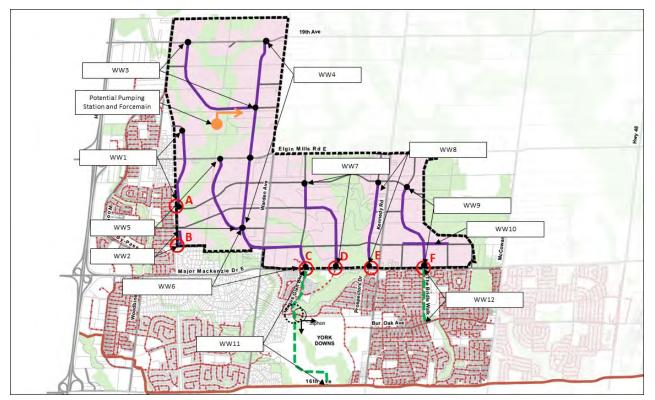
Recommended Community Structure Plan with Wastewater Servicing
